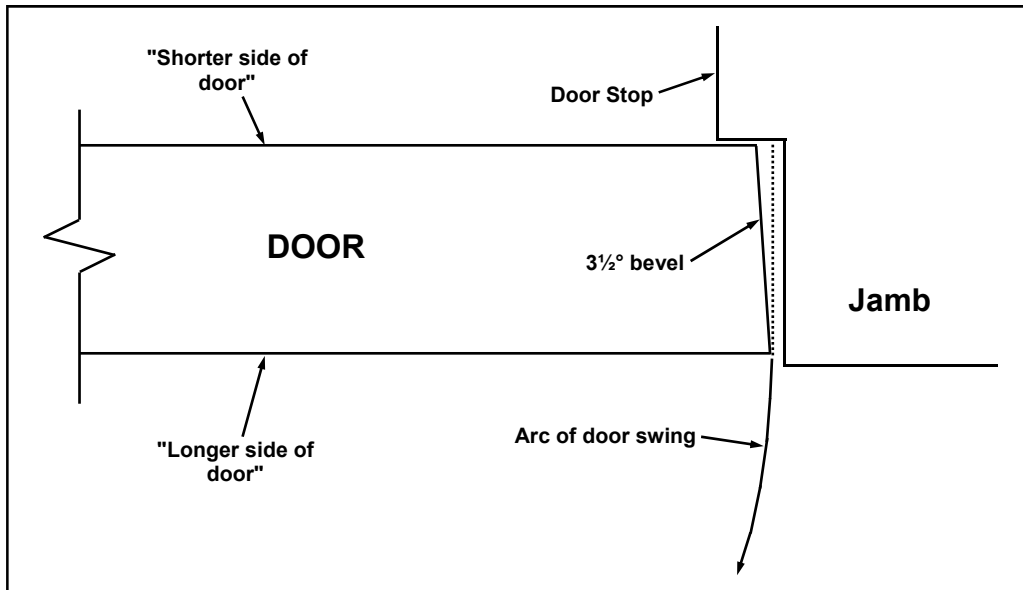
EXAMPLE OF BEVELED DOOR (TOP VIEW)
